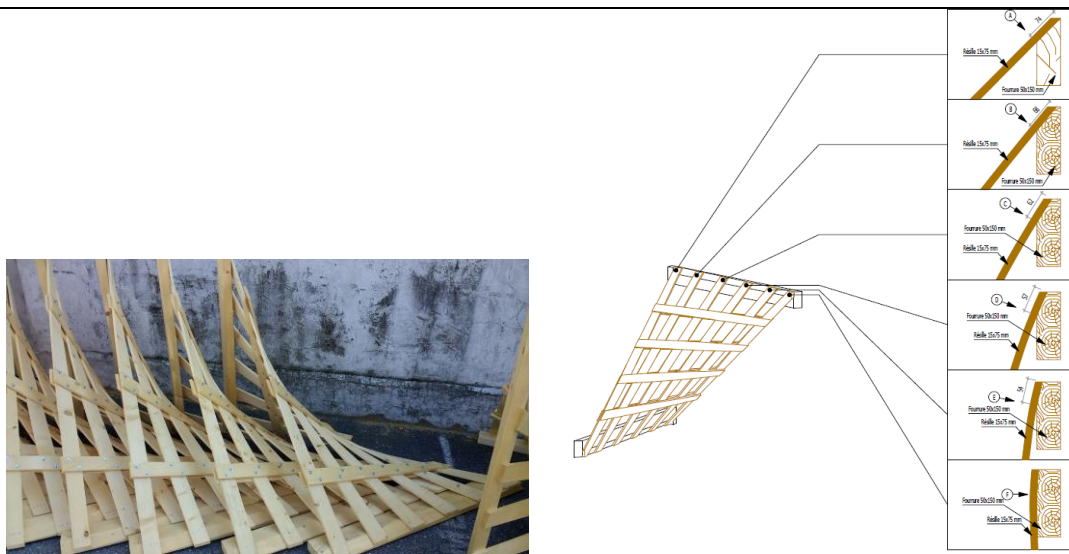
a) Hypars built independently b) Connection with the top and bottom edge beam
